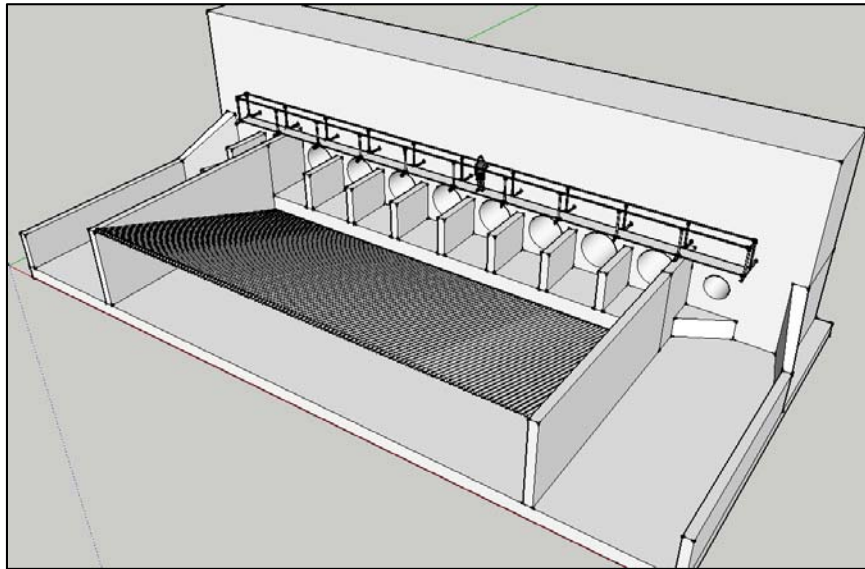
3-dimensional view of features on the downstream side of KLOG with two raised side walls, the concrete bullnose removed, and a picket weir at the base of the existing gate wall slab.
